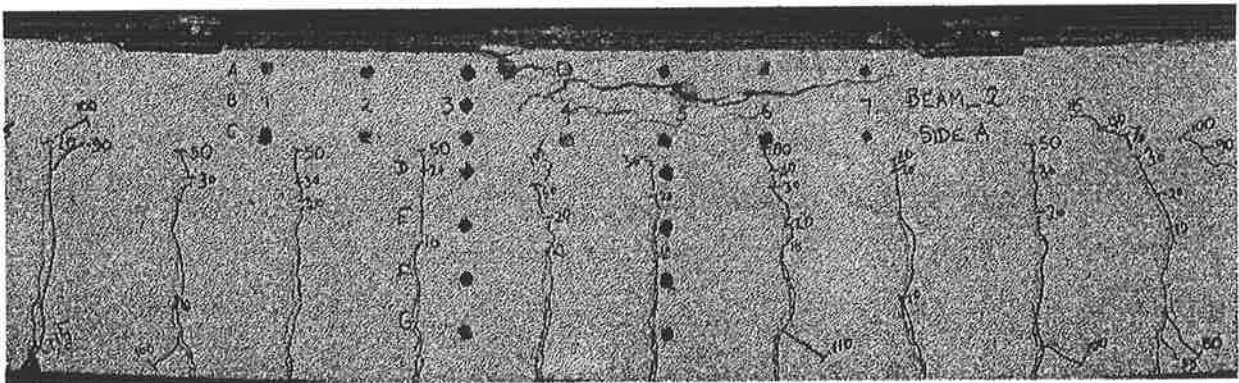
Beam 2 starts failing at 118.8kN.
